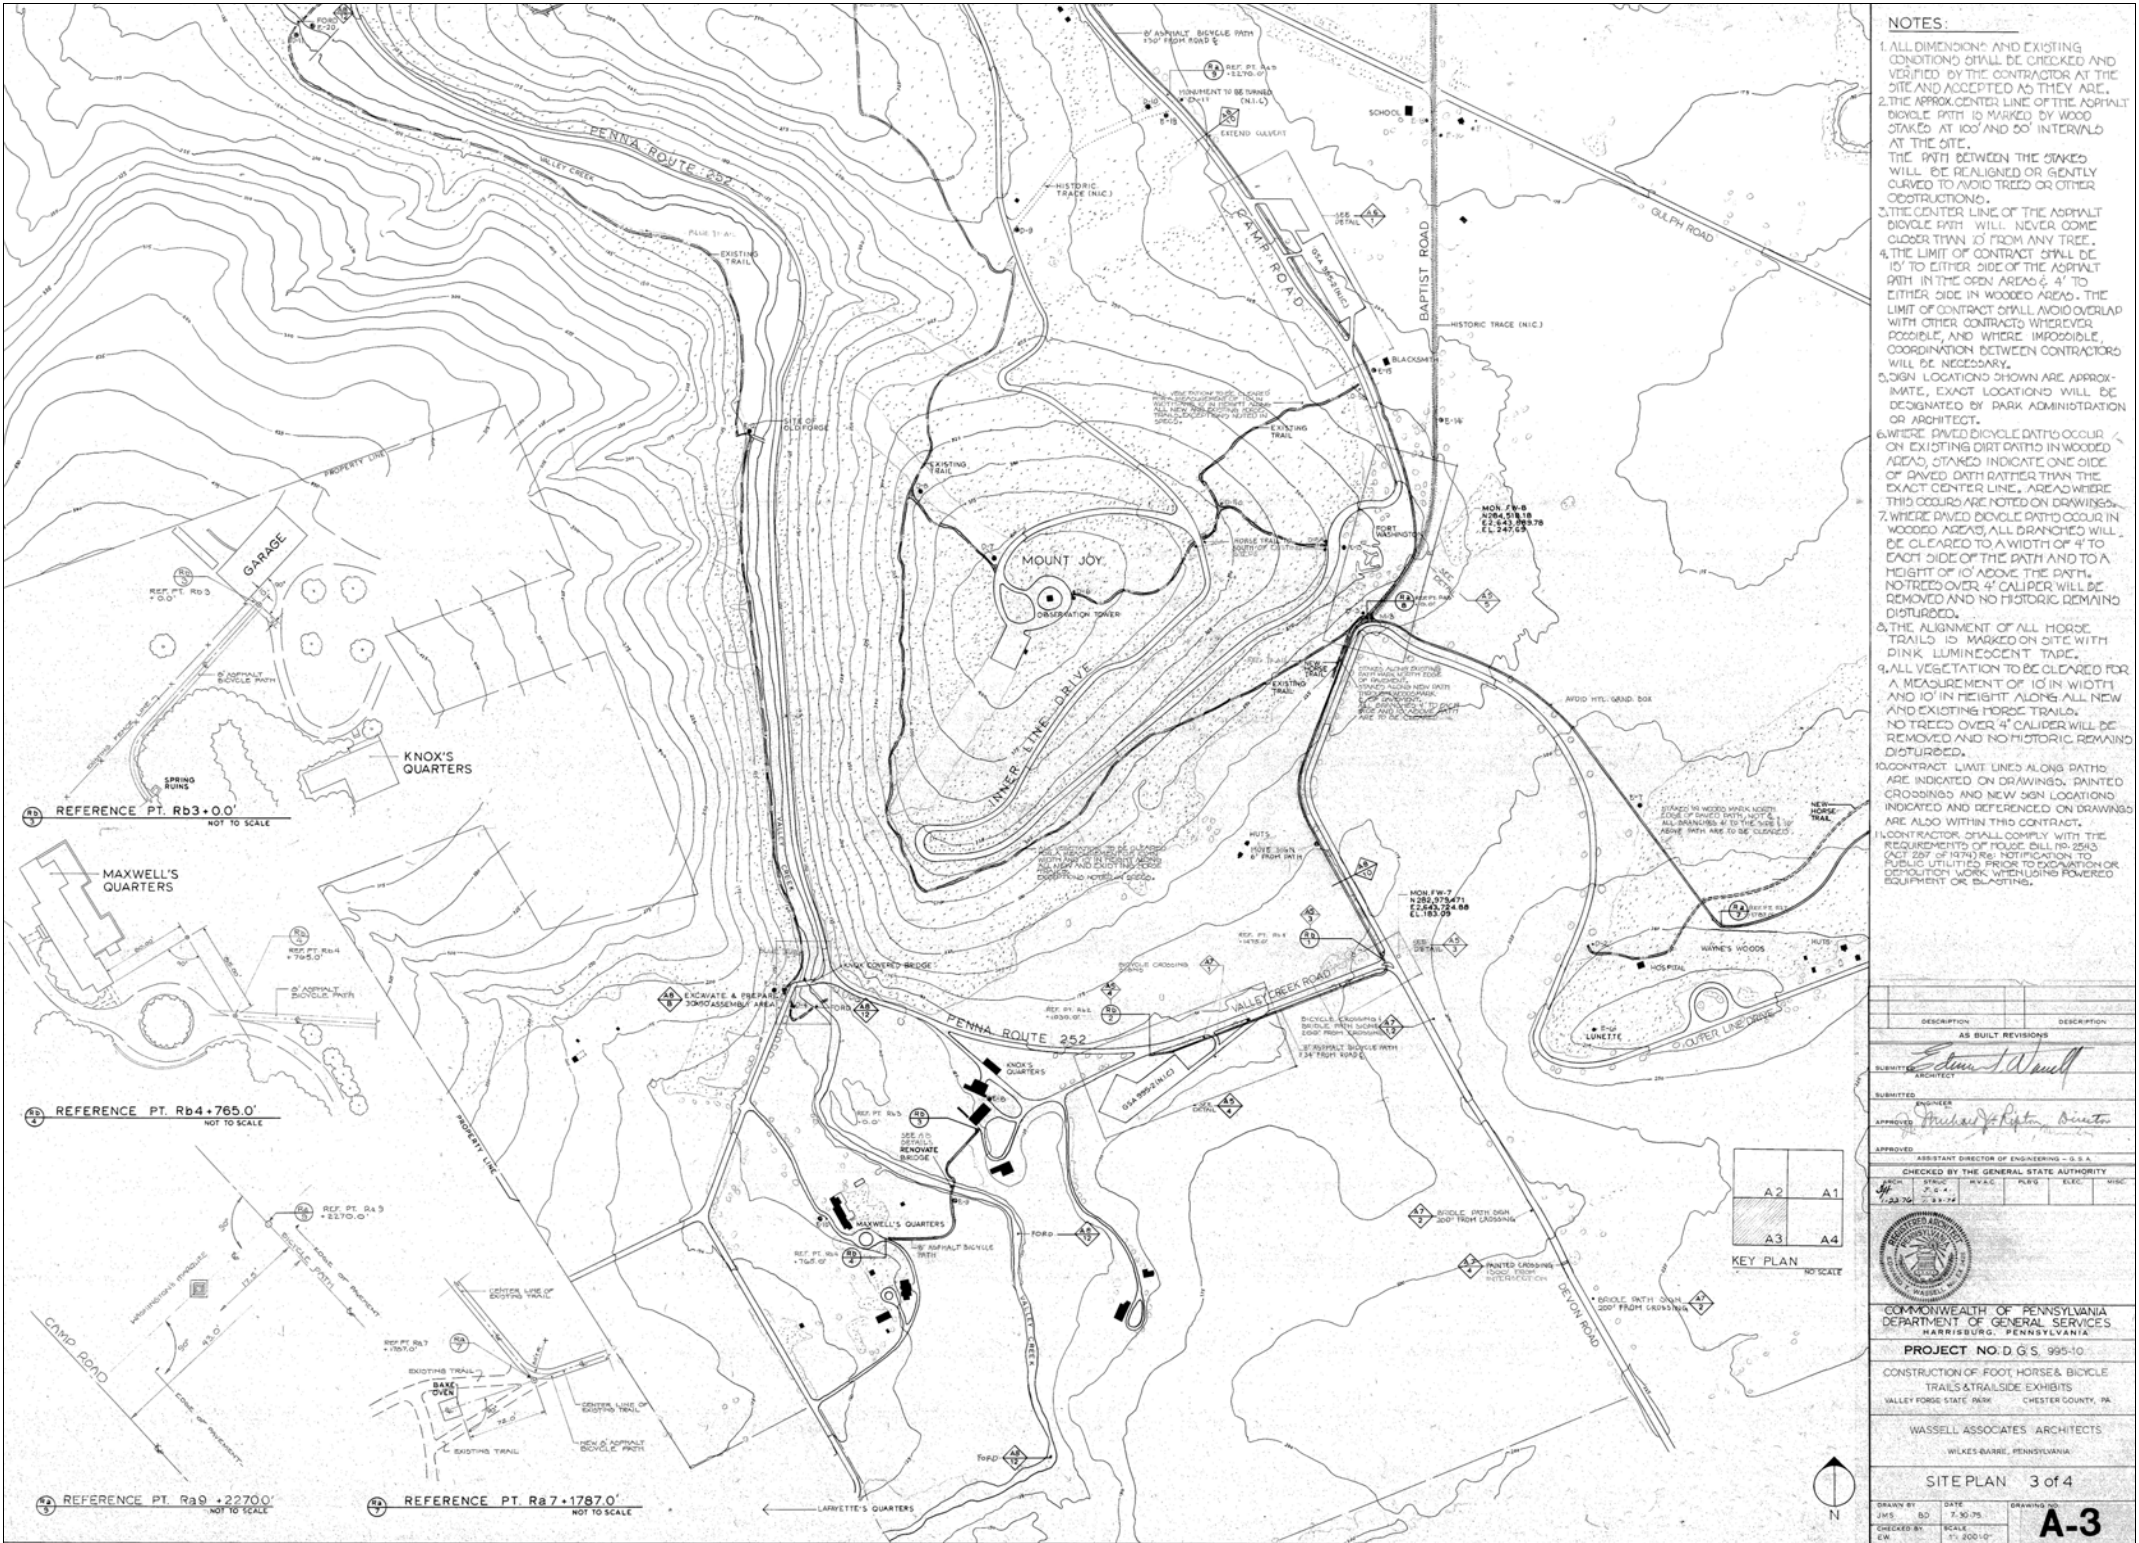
Plan showing Construction of Foot, Horse and bicycle trails and trailside exhibits, Site Plan 3 of 4, by Wassell Associates Architects, July 30, 1975 (VAFO Archives).
